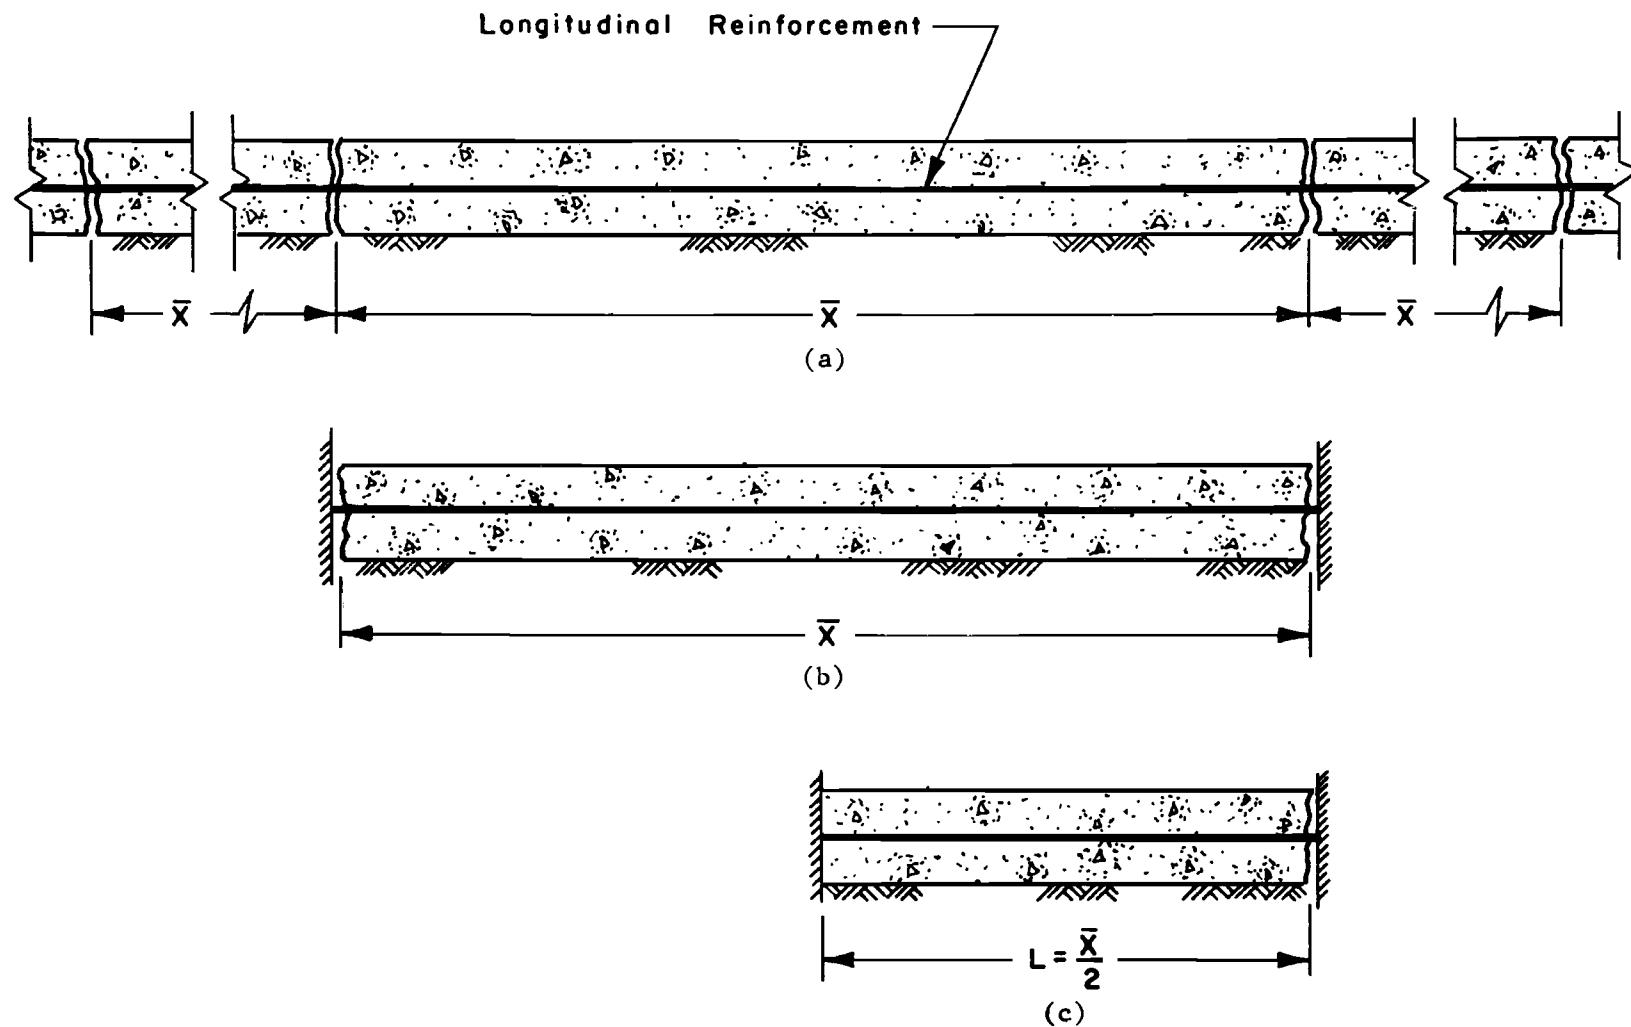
Continuously reinforced concrete pavement geometric model (Ref 5).
